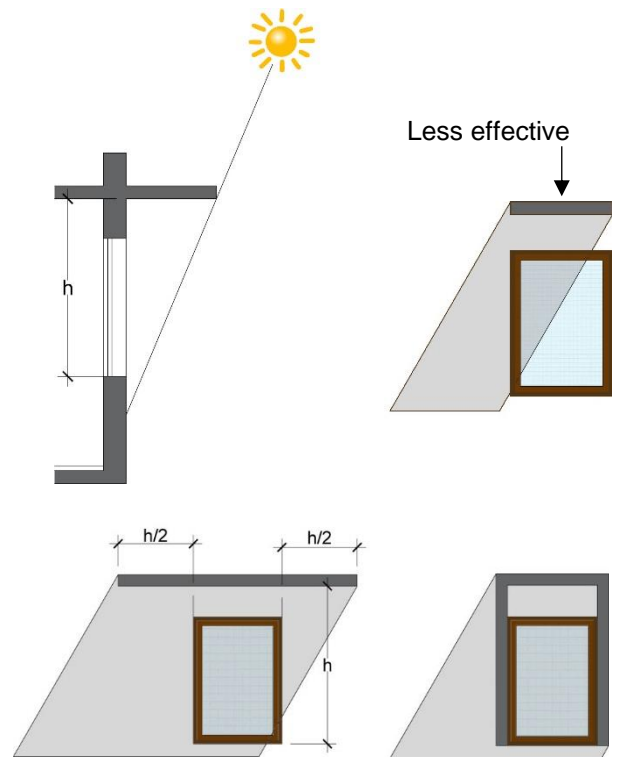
Guideline for designing effective horizontal shading for windows on south façade. Image adapted from: The Carbon Neutral Design Project (6)
